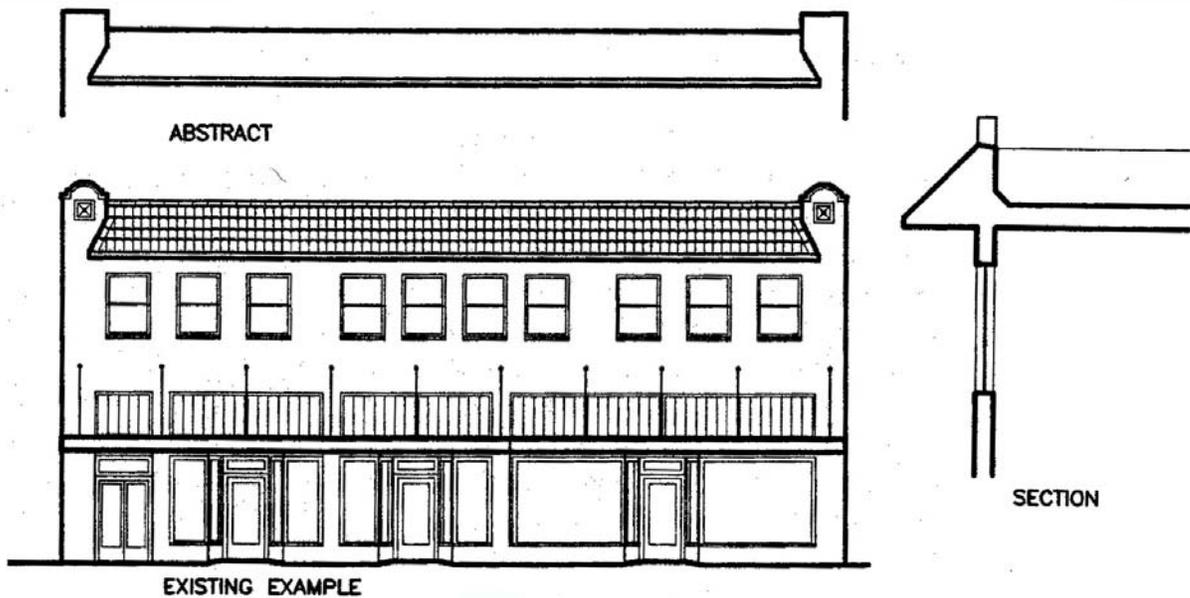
A projecting band of skirting at the parapet provides a visual cap and a protective cap for the windows below. (Skirting that extends the full story height is not encouraged.)
